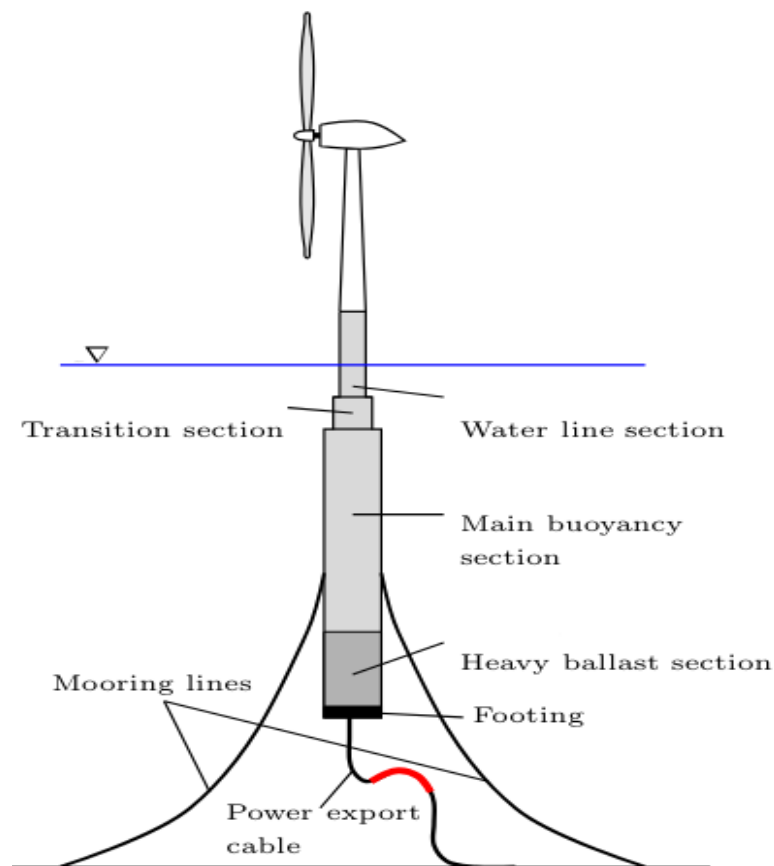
Section of a Spar buoy platform. (Source: Fylling, Berthelsen, 2011)
